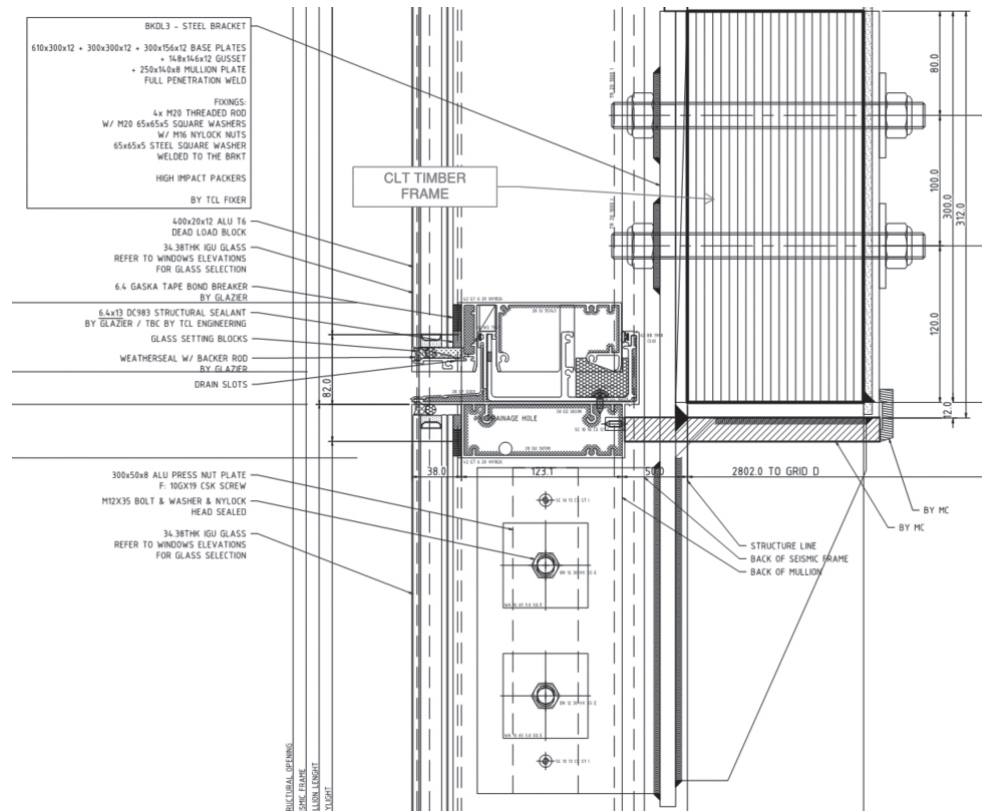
Fixing of Curtain Wall System to LVL Timber Frame snapshot from Thermosash Shop Drawing - no. 505
